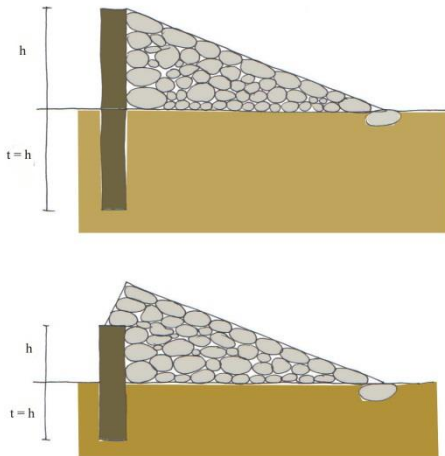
stone dam reinforced by a masonry wall is an alternative in difficult conditions to a pore stone dam.
